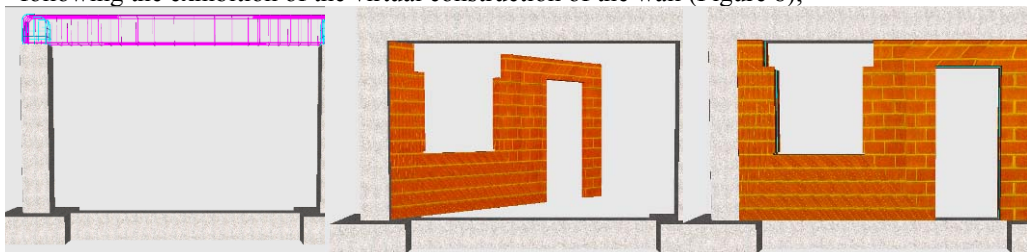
The relationships between the architectural configurations and the structural elements in a wall
